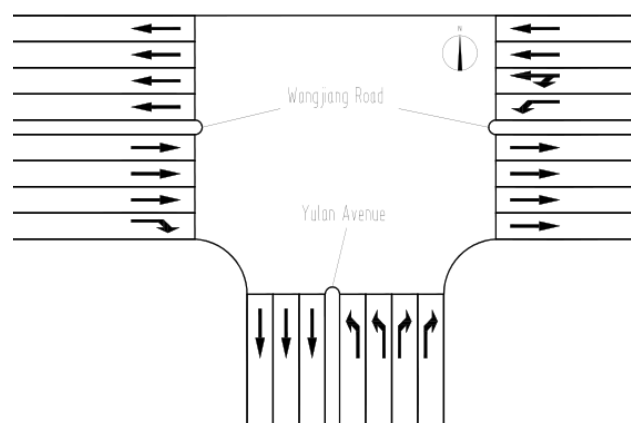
Distribution of intersection of Wangjiang West Road and Yulan Avenue
